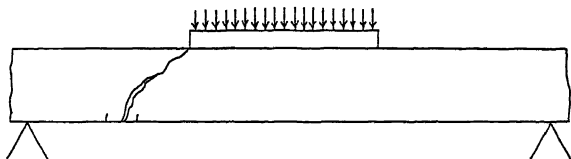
“Diagonal Tension” Failure in a Concrete Beam
